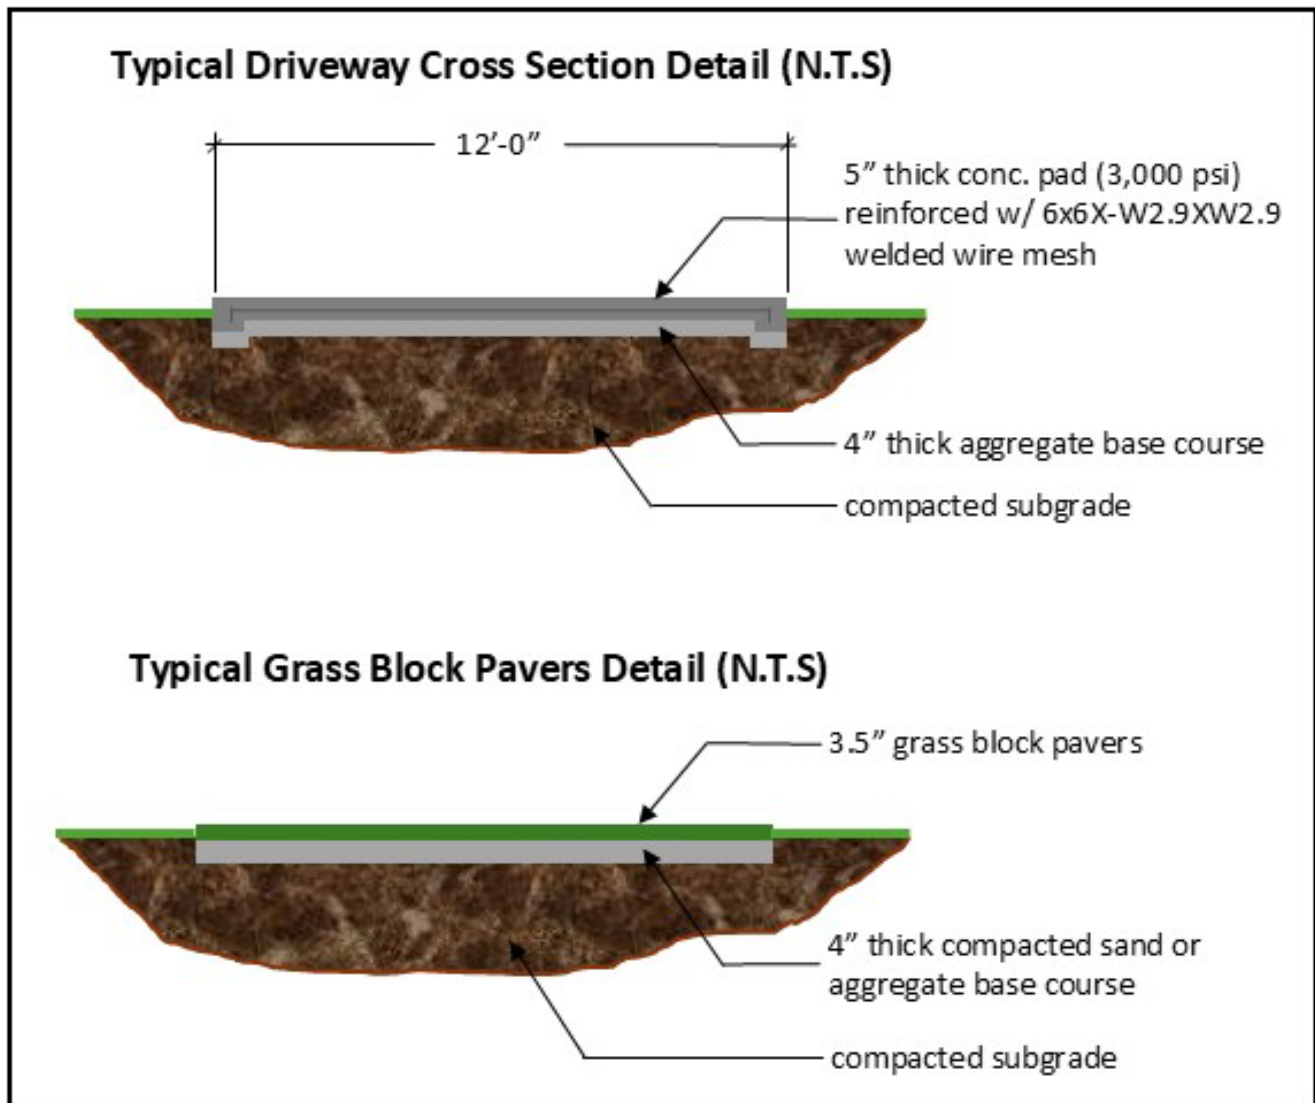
Gravel Driveway and Grass Block Pavers - Typical Cross Section Details
